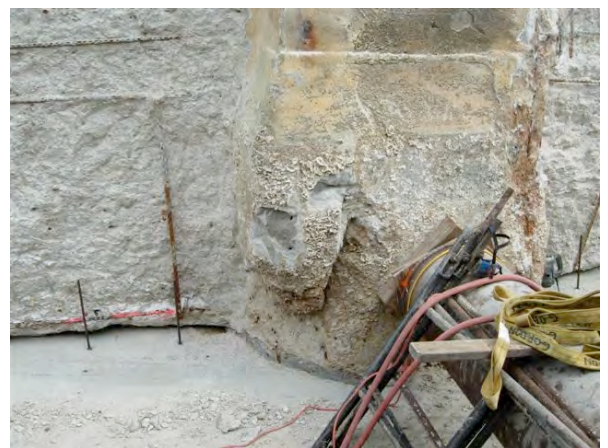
Showing the Top Layer of the Reinforcing Steel in the New Waterline Footing (At the Middle Opening of the Existing Waterline Footing)
